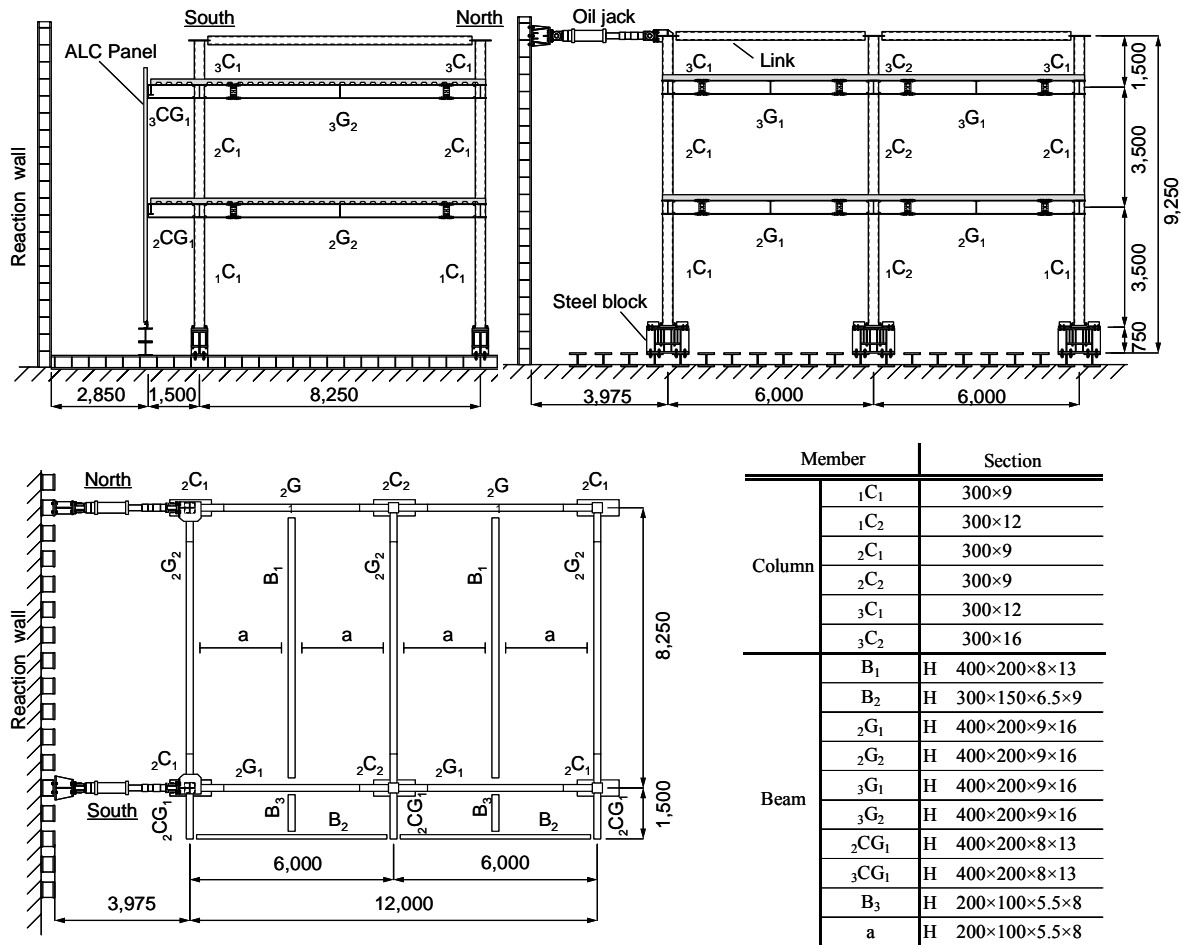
Plan and Elevation of Test Structure (unit: mm)
